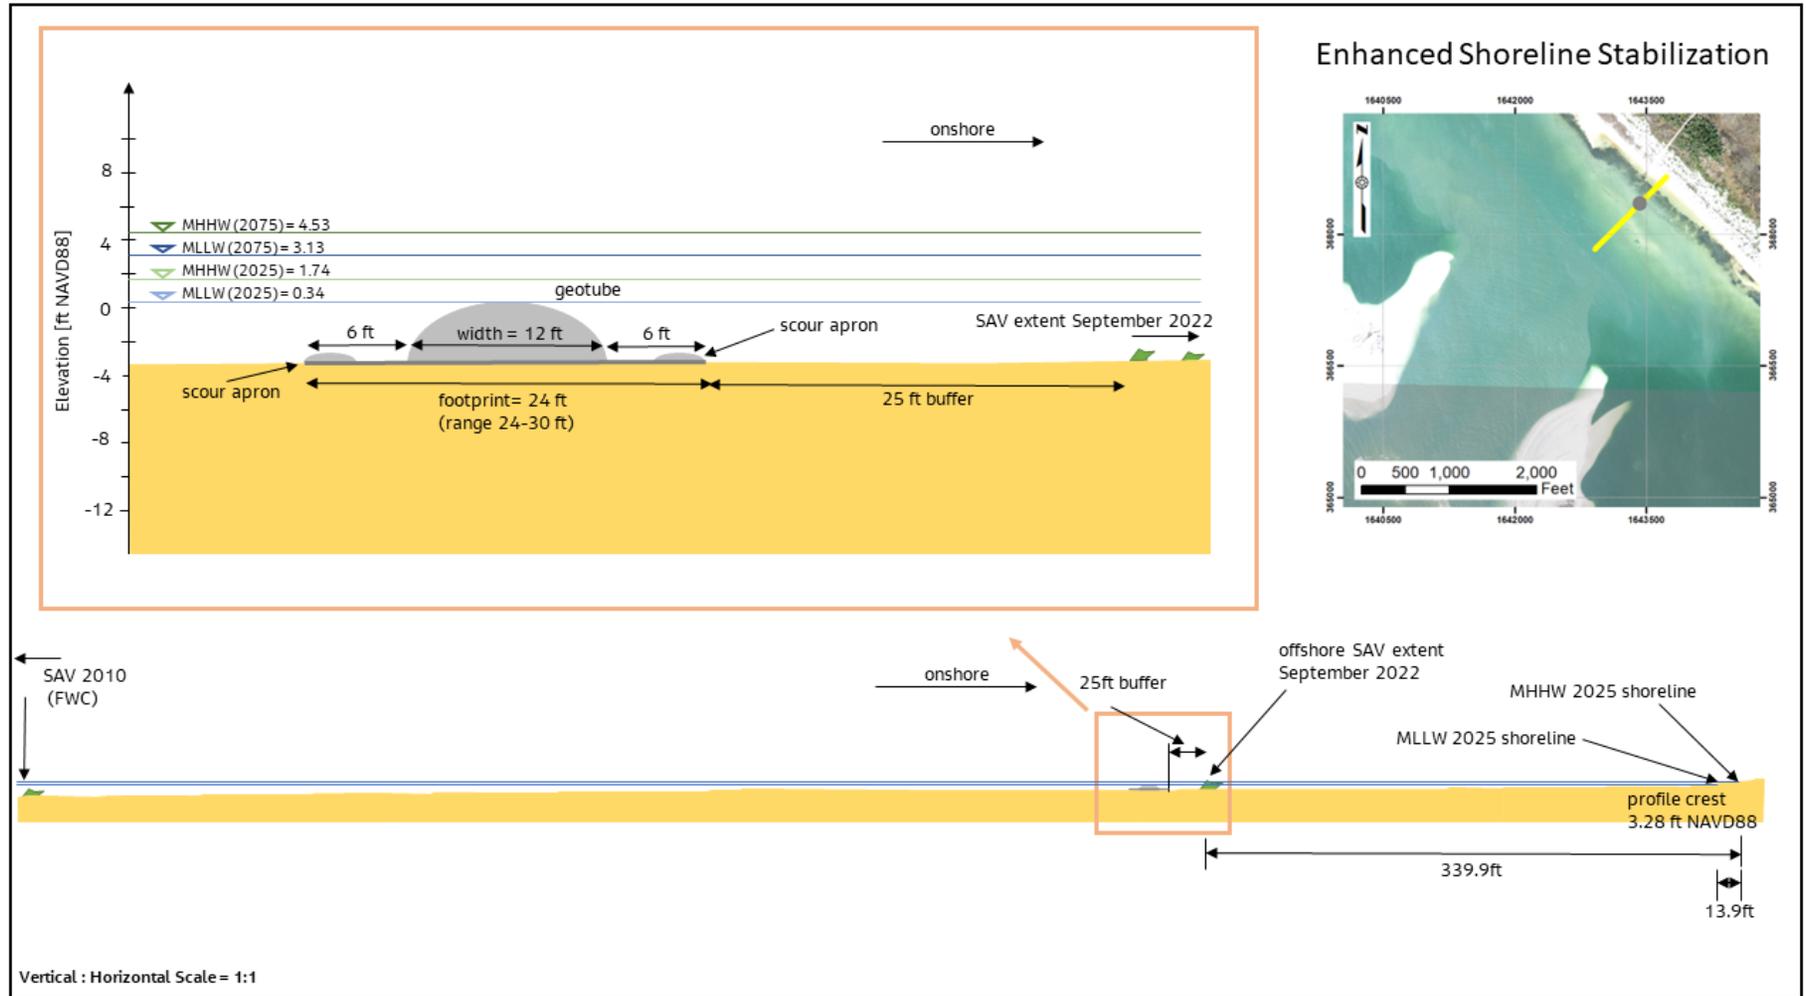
Geotubes with a Crest Elevation at MLLW 2025
